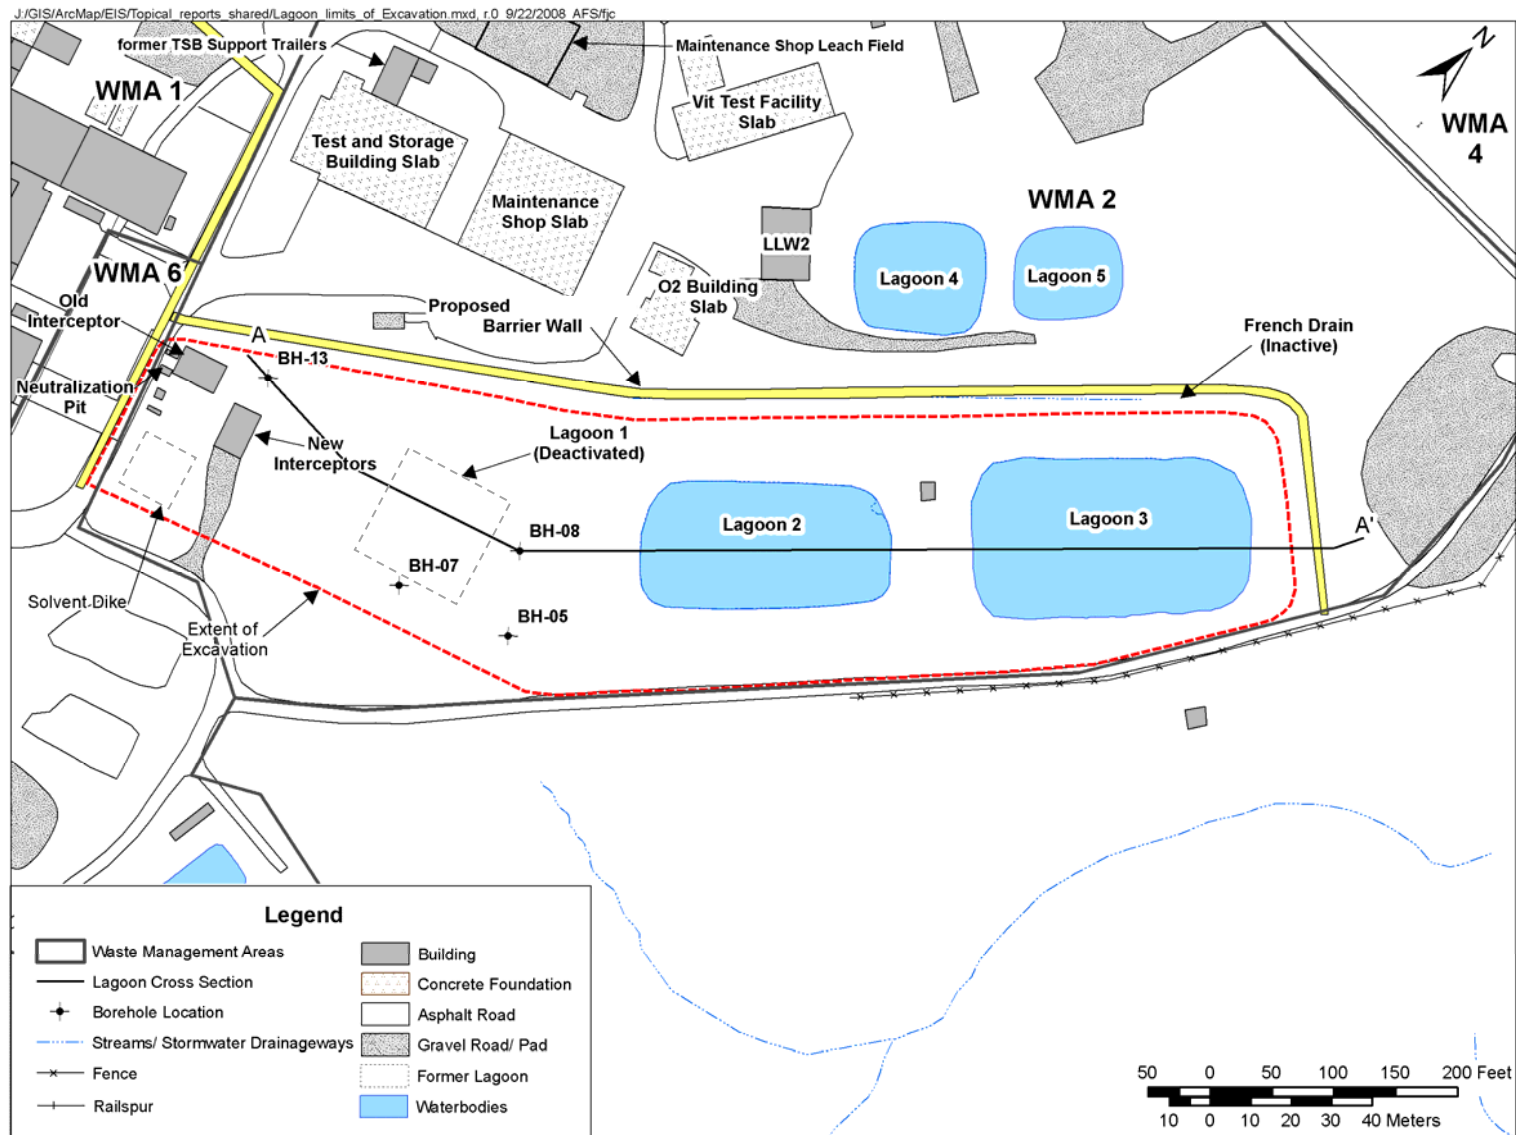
Conceptual Arrangement of WMA 2 Excavation, Plan View
